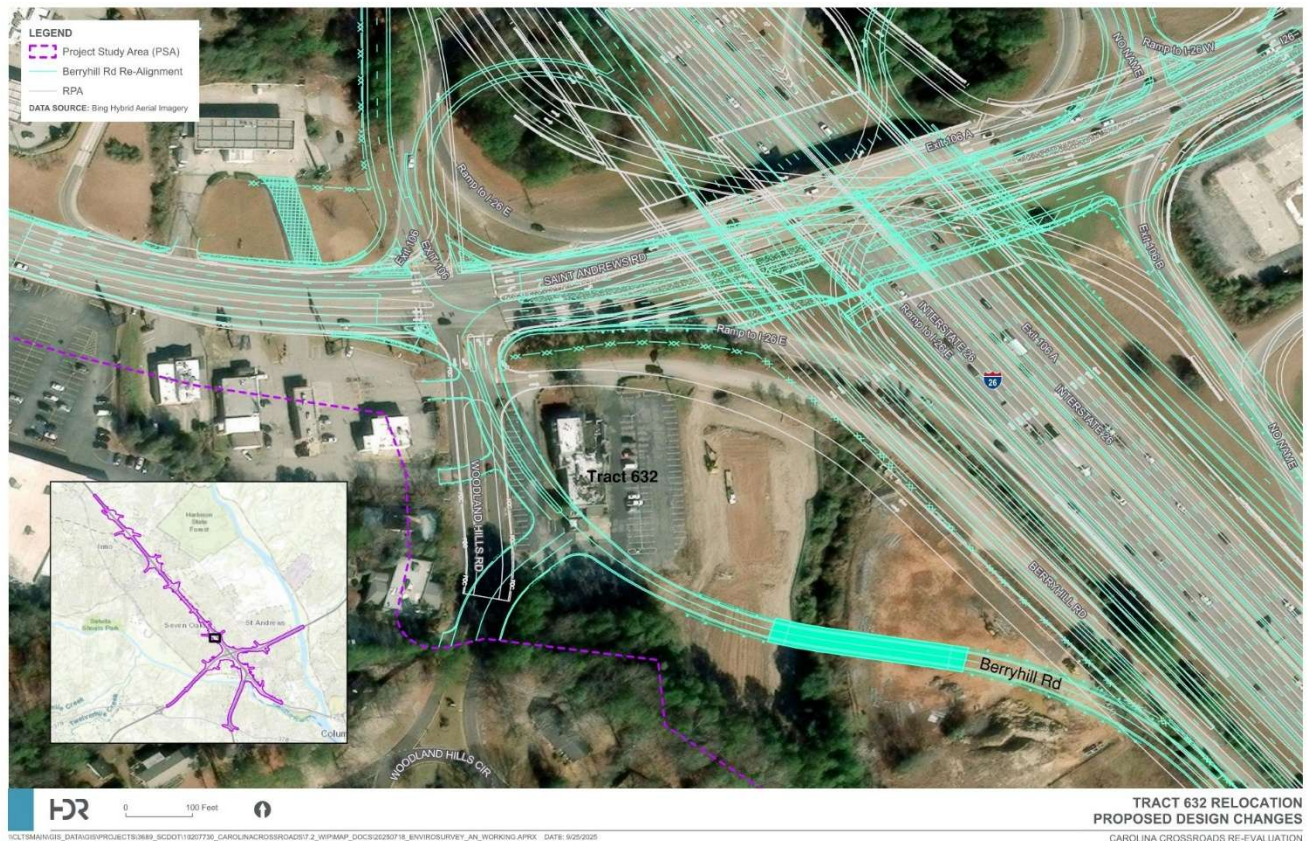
Berryhill Road/Woodland Hills Road Intersection Realignment
